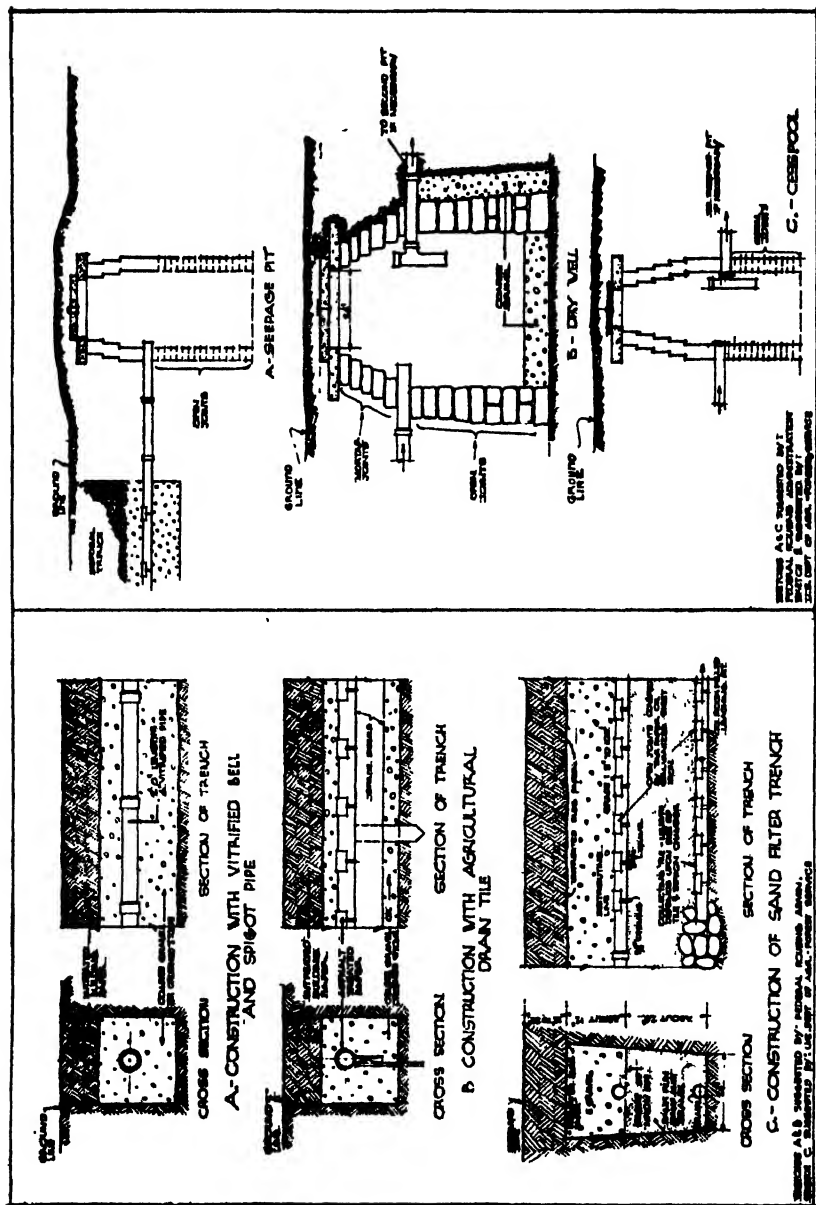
Subsurface disposal trenches and sand filter trench
